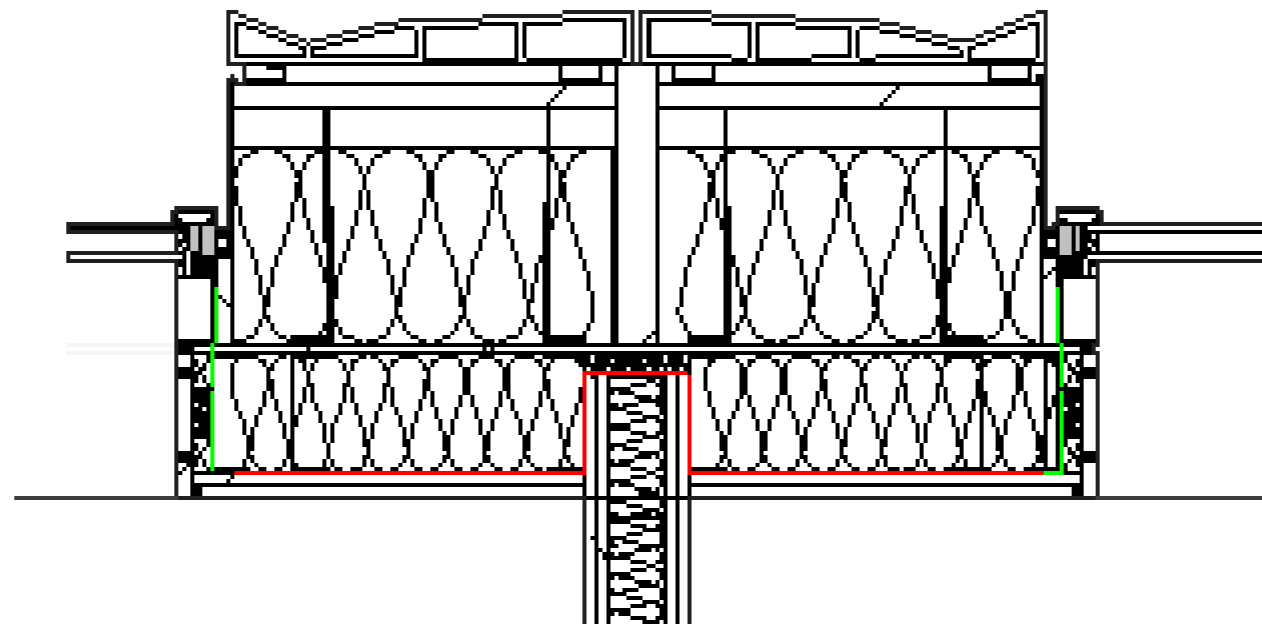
Rainscreen Ceramic Plan Detail (Author, 2021)
